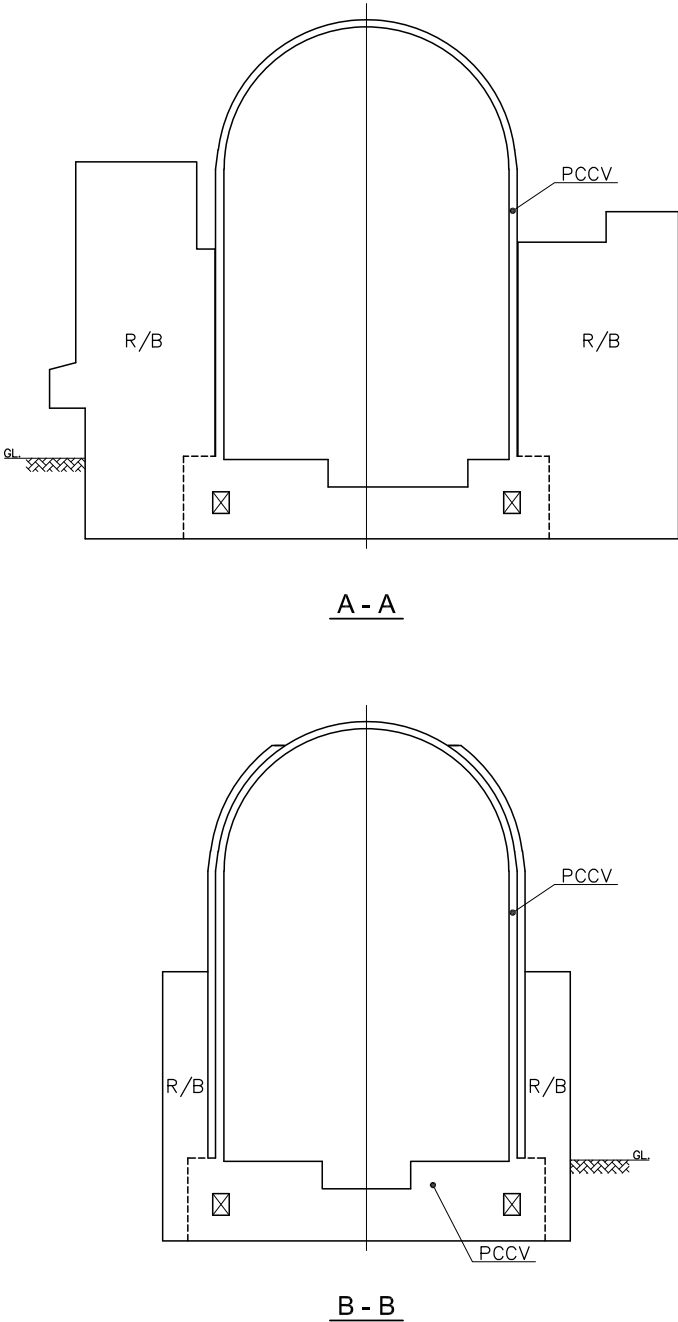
US-APWR Building Configuration (Section Views)
